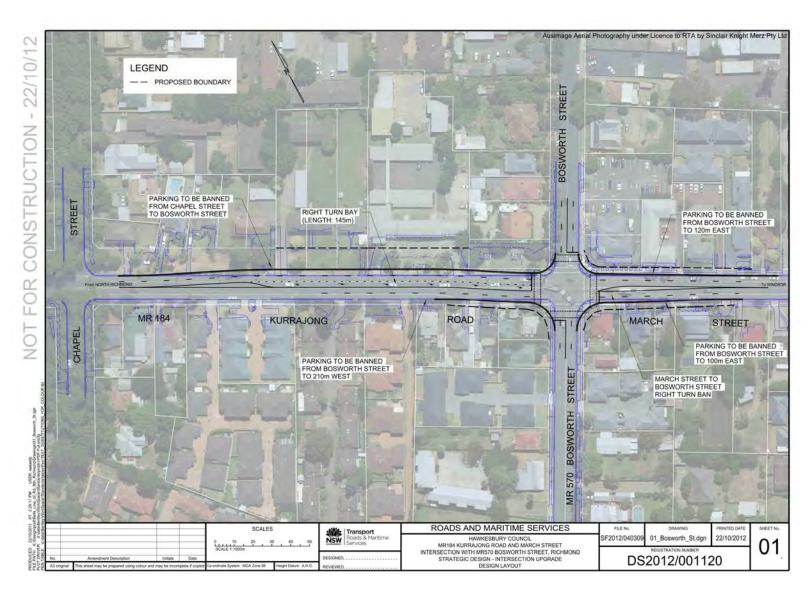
Richmond Bridge Approaches study area location, Kurrajong Road/Bosworth Street Intersection
